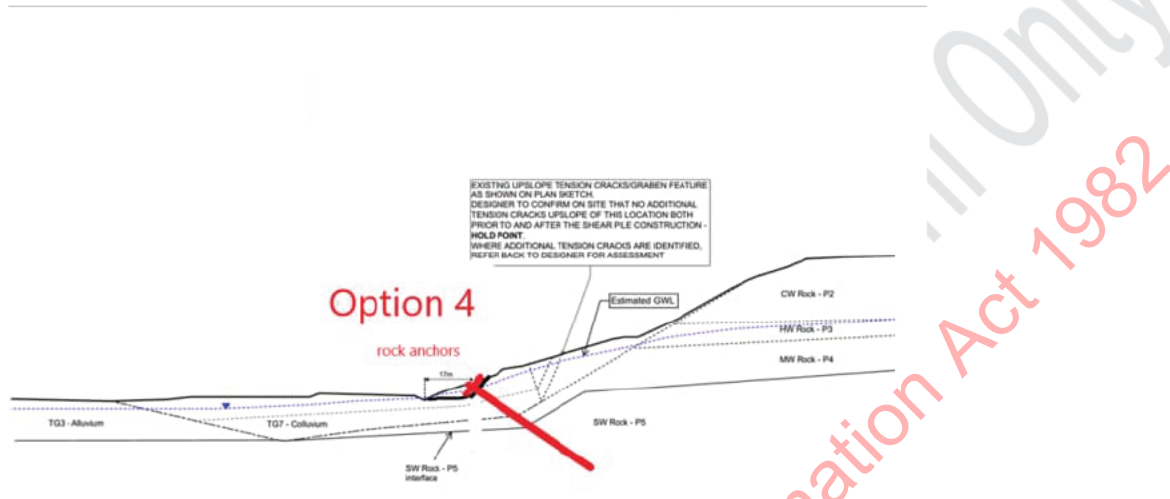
Modified NX2 sketch to show potential rock anchor option for consideration
